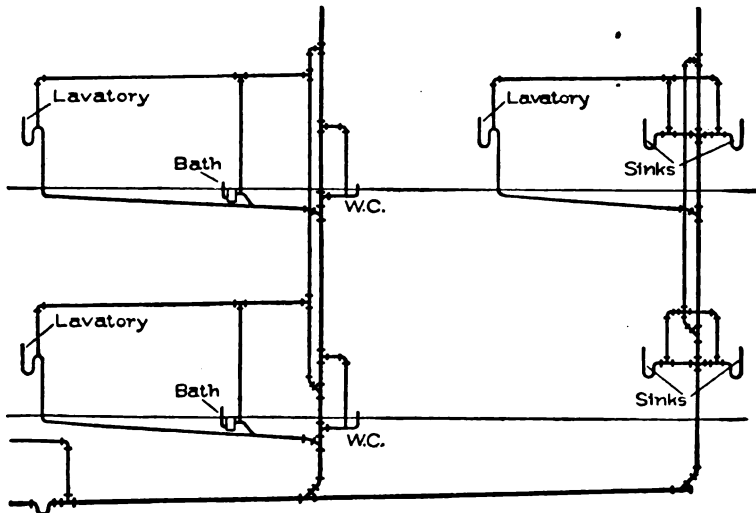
Showing Layout of Soil, Waste, and Vent Pipes of Several Groups of Superimposed Fixtures in Same Building.
